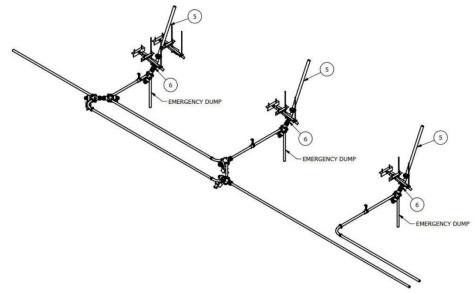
Surface Borehole Breakthrough Piping General Arrangement (Future)
